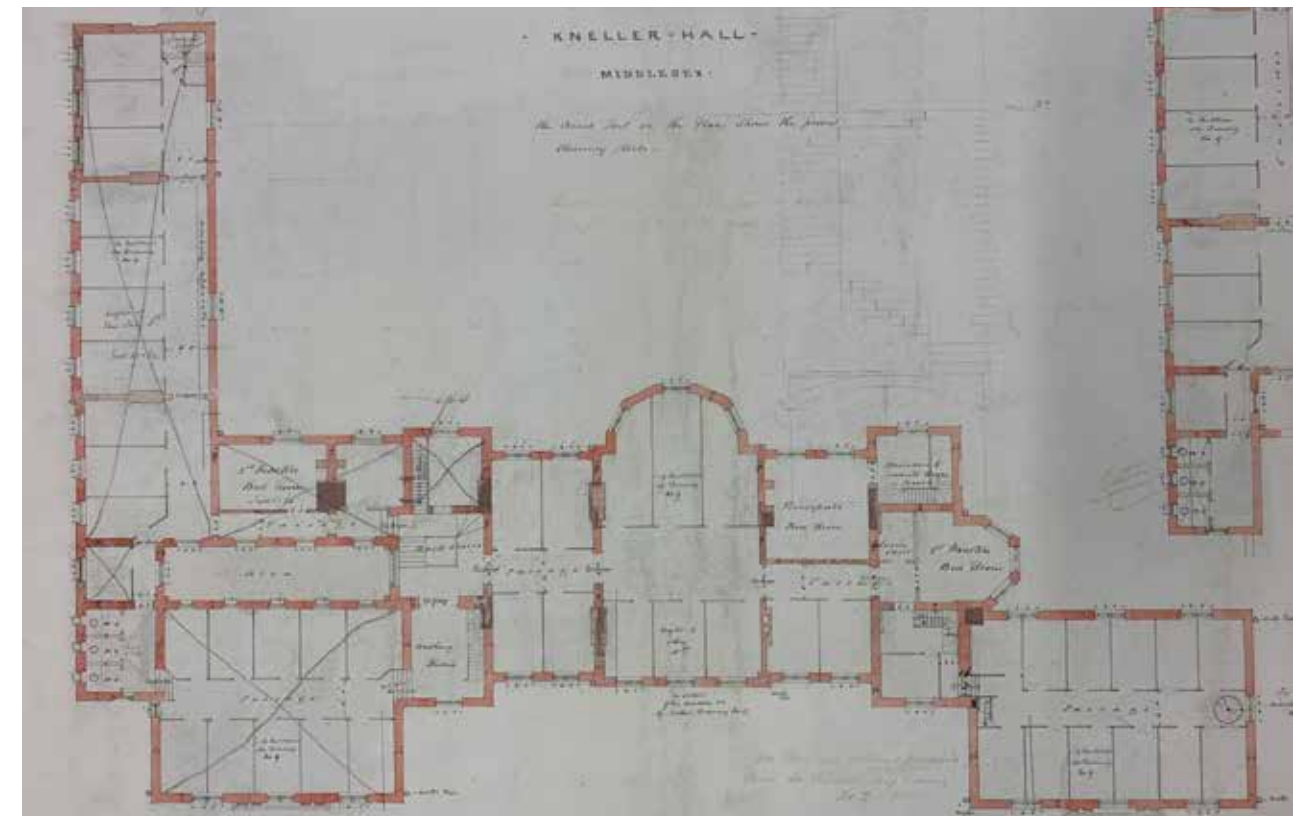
1848 proposed second floor plan of Kneller Hall, unrealised (red showing the proposal). By George Mair.
